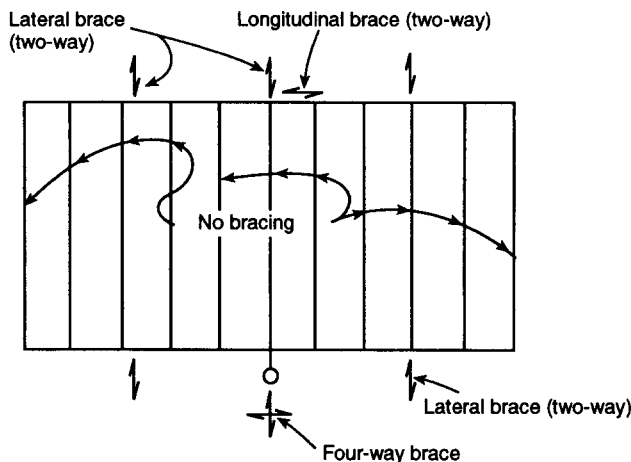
(c) Typical location of bracing on a gridded system.
